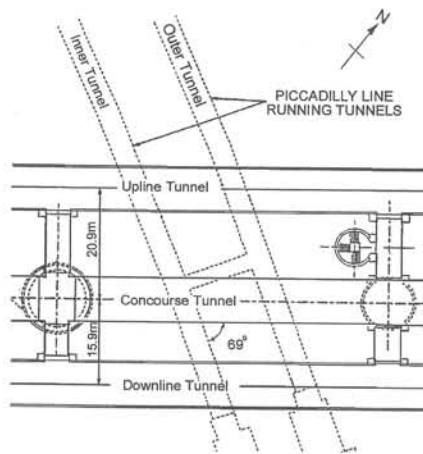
Layouts of the piccadilly line tunnels and the Heathrow Airport Express tunnels.
